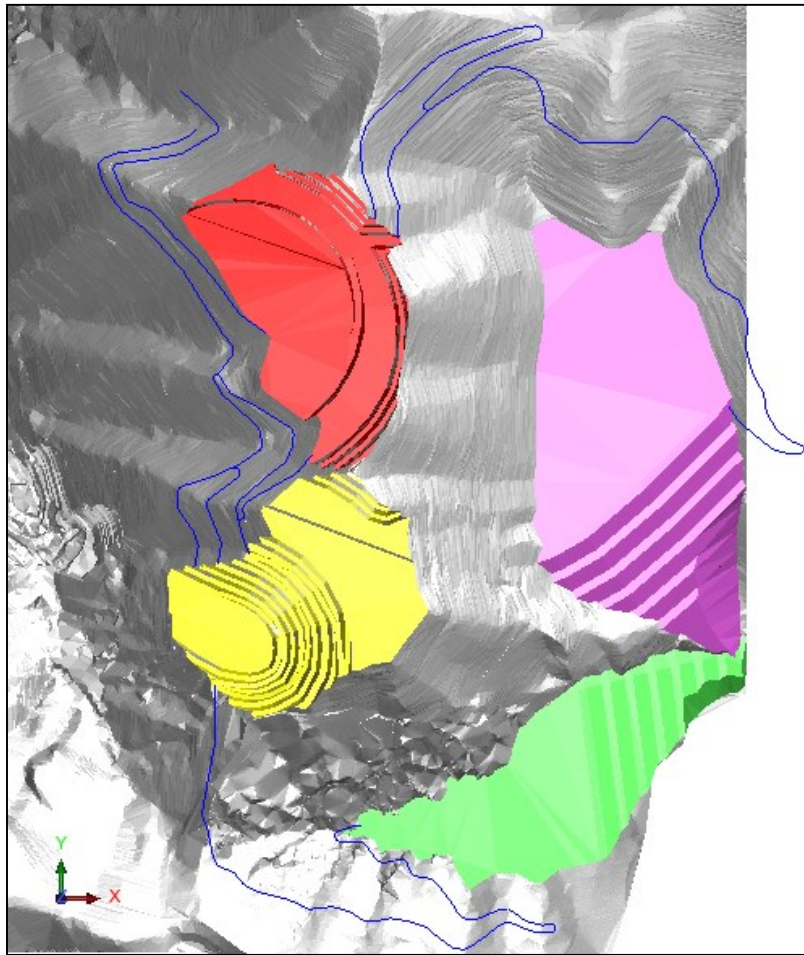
Open Cut 2017 (Year 4) Stage Plan
